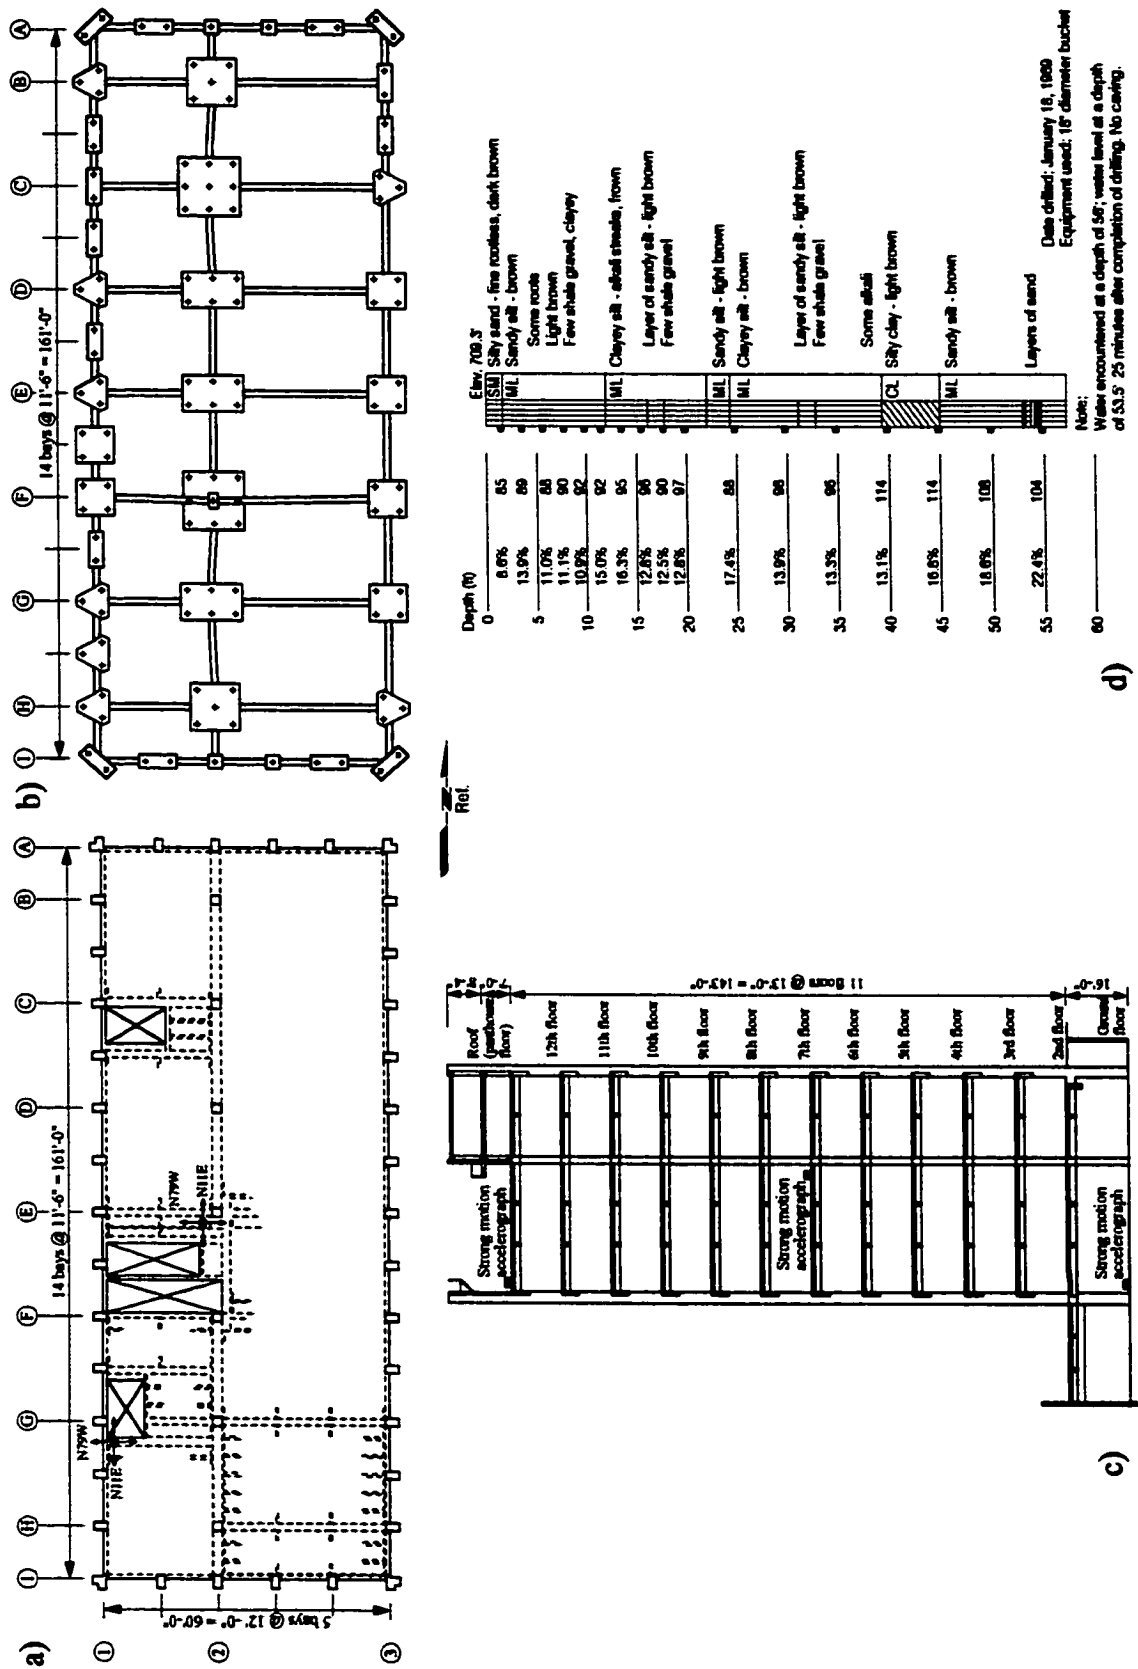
(a) Typical floor plan, (b) Typical transverse section, and (d) Log of typical soil boring of the VN7SH.
